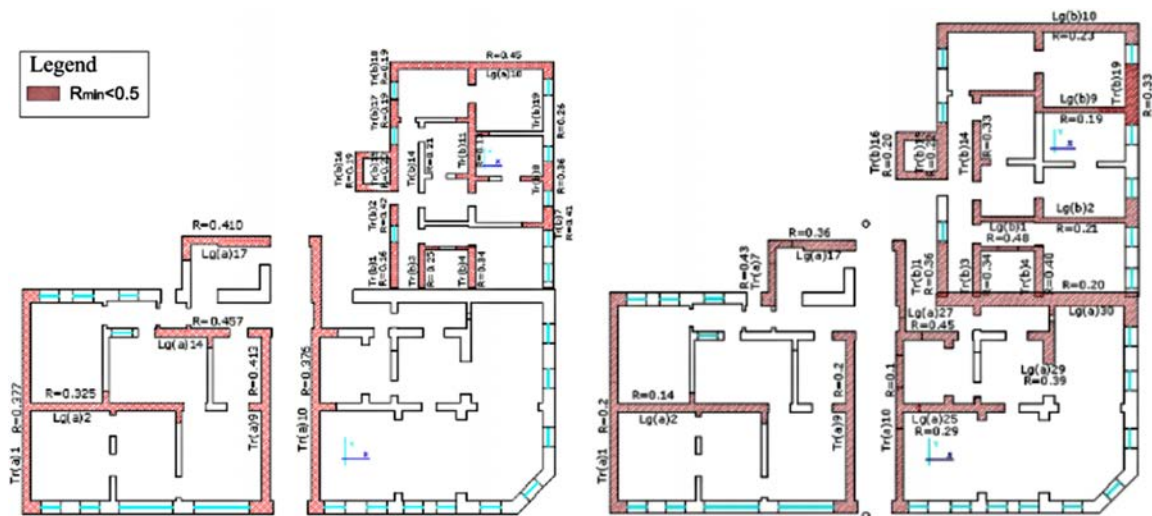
Axial and shear force bearing capacity for 3 storey masonry building.
